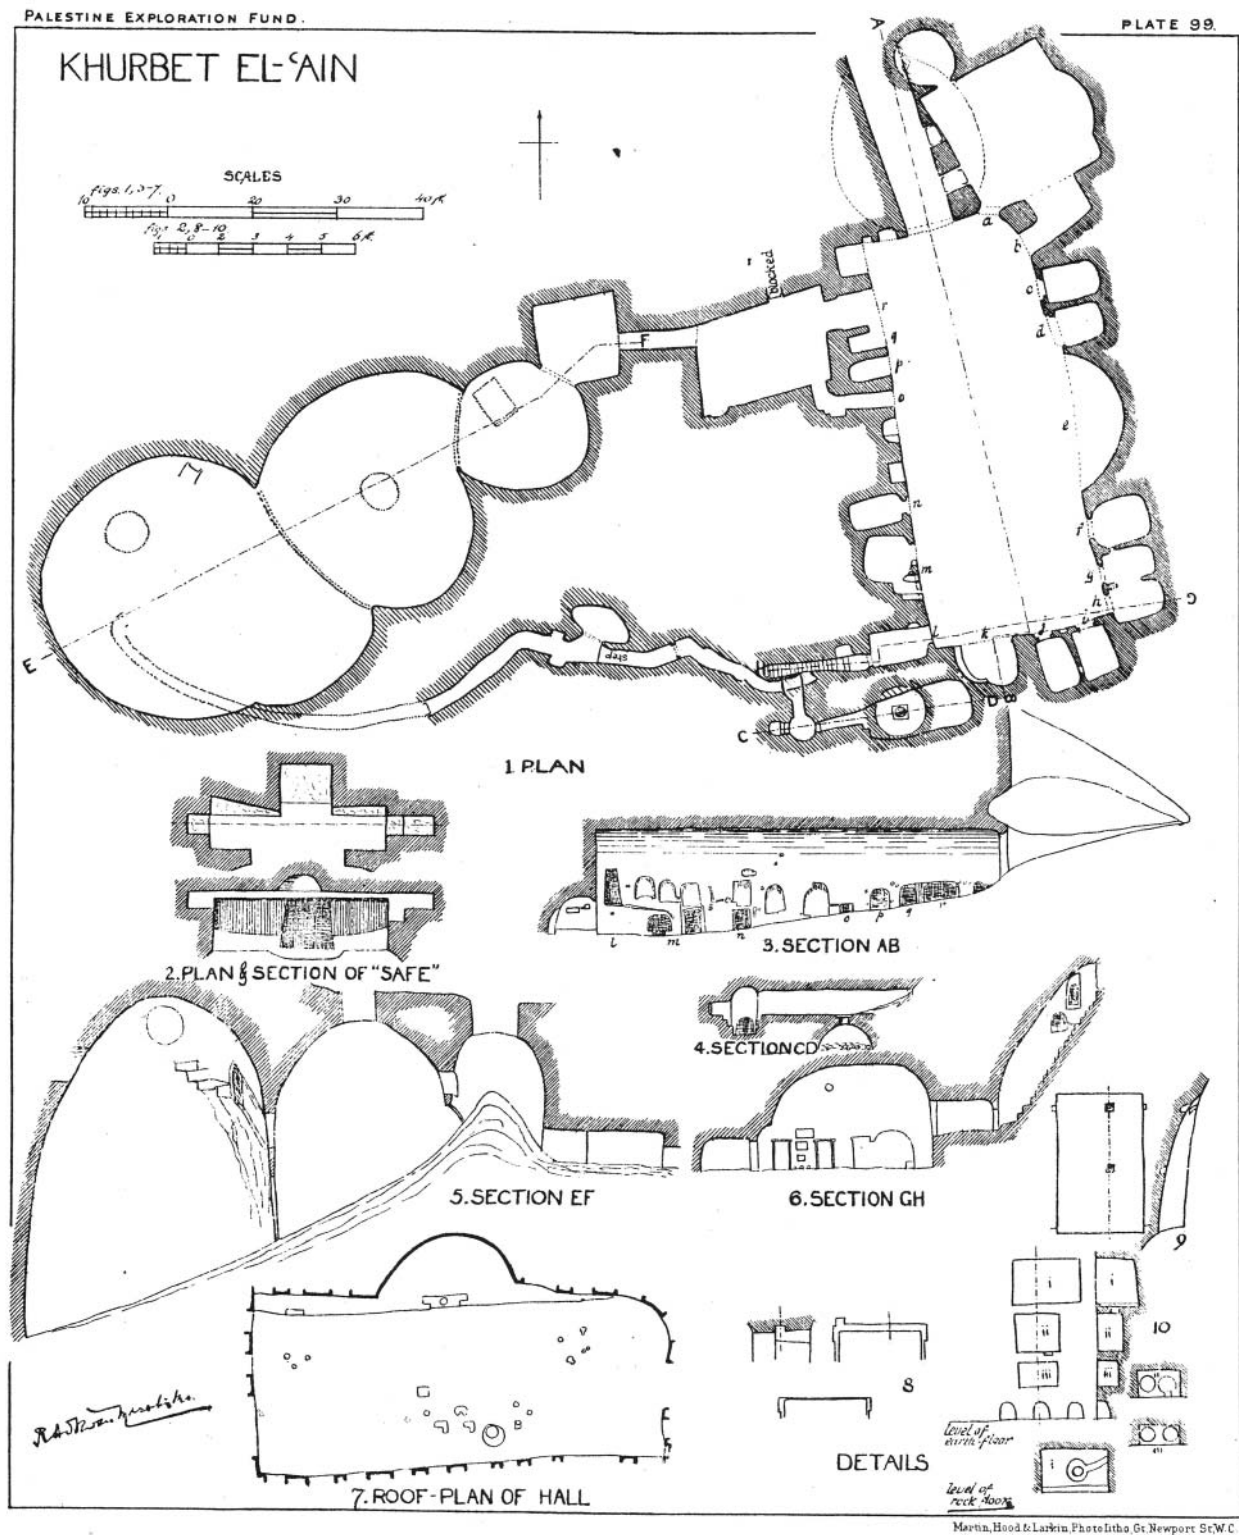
Plan, sections and details of the second underground system at Khurbet el-'Ain.
